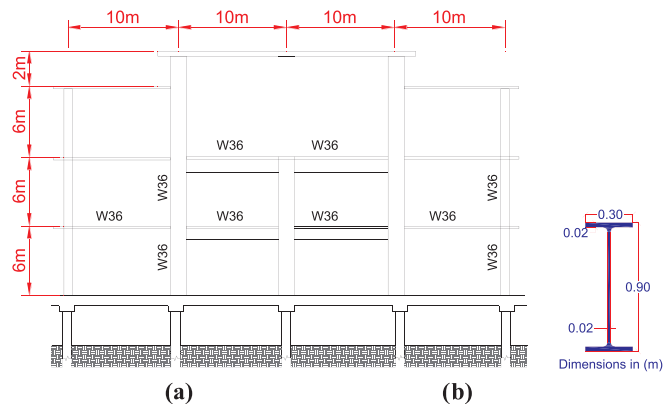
(a) Elevation view of the analyzed building and (b) W36 × 135 cross section.
